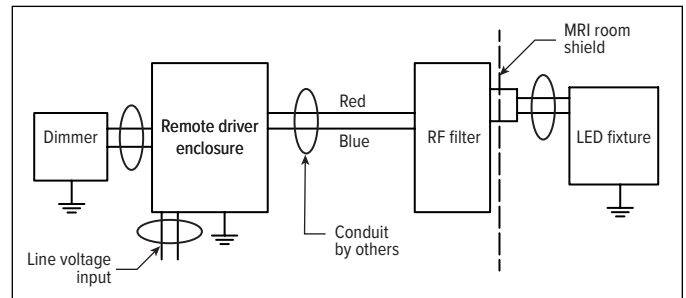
RDB1 Remote driver enclosure for single fixture with EM/12W
